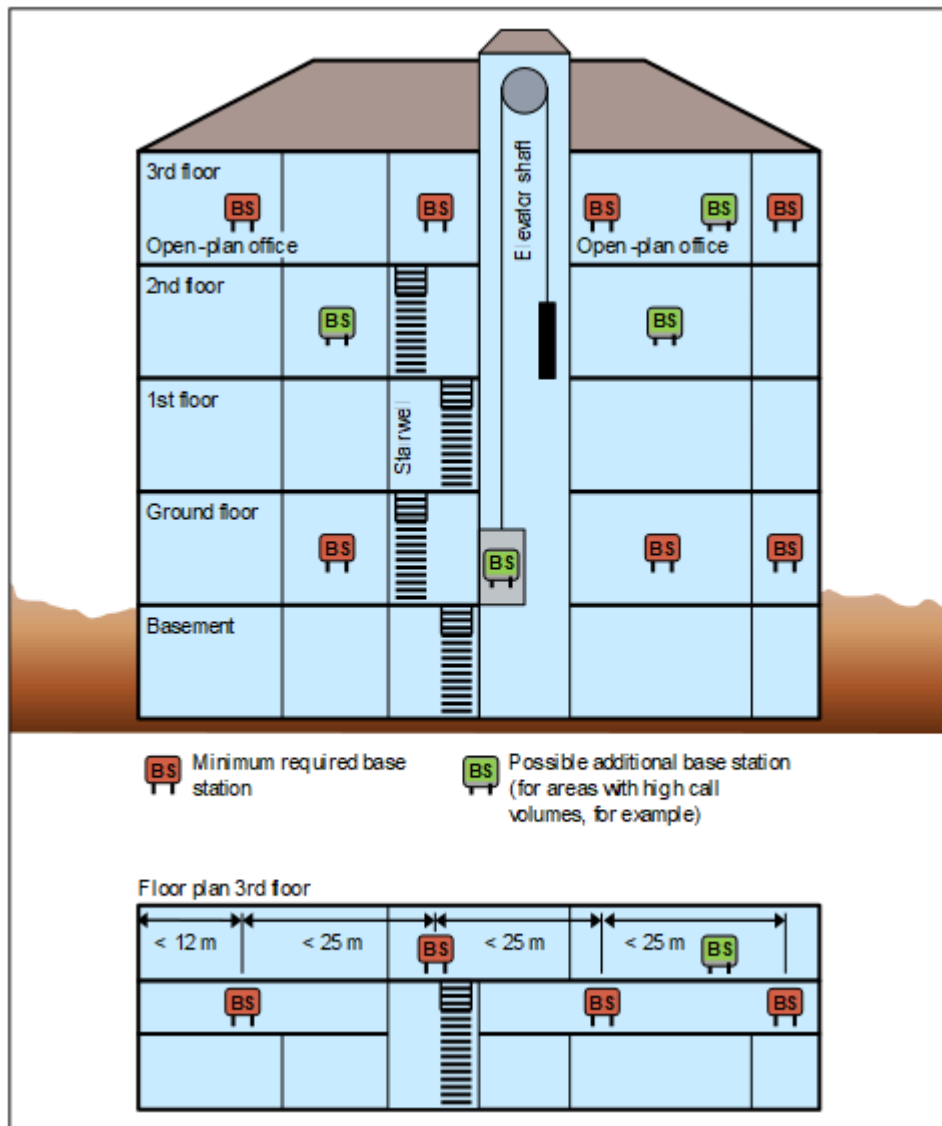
Example for the placement of base stations in steel concrete buildings with concrete and steel walls
